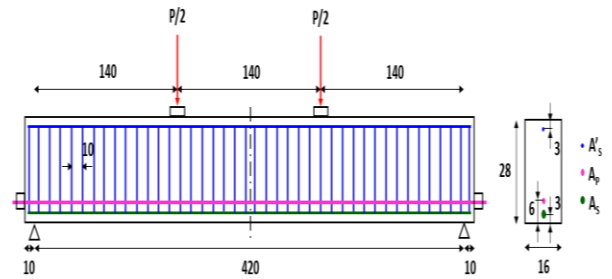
Sketch of the longitudinal and cross sections of the beams originally tested by Gongchen and Xuekang (1988), (dimensions in cm)
